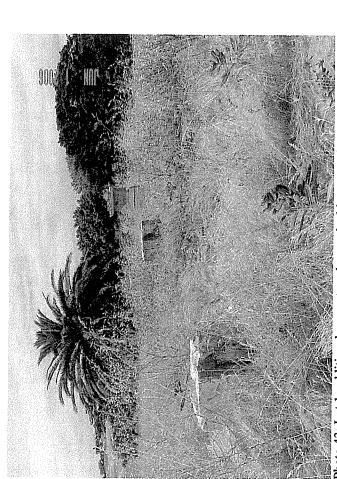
Lot 1; additional concrete columns, looking west along a dirt road through the site.
